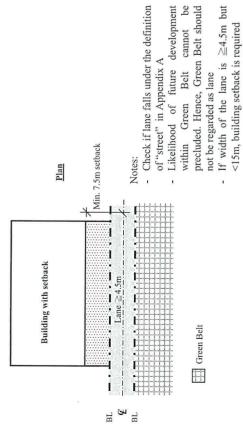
Example (1) of Building Setback - Site abutting narrow lane with Green Belt beyond
